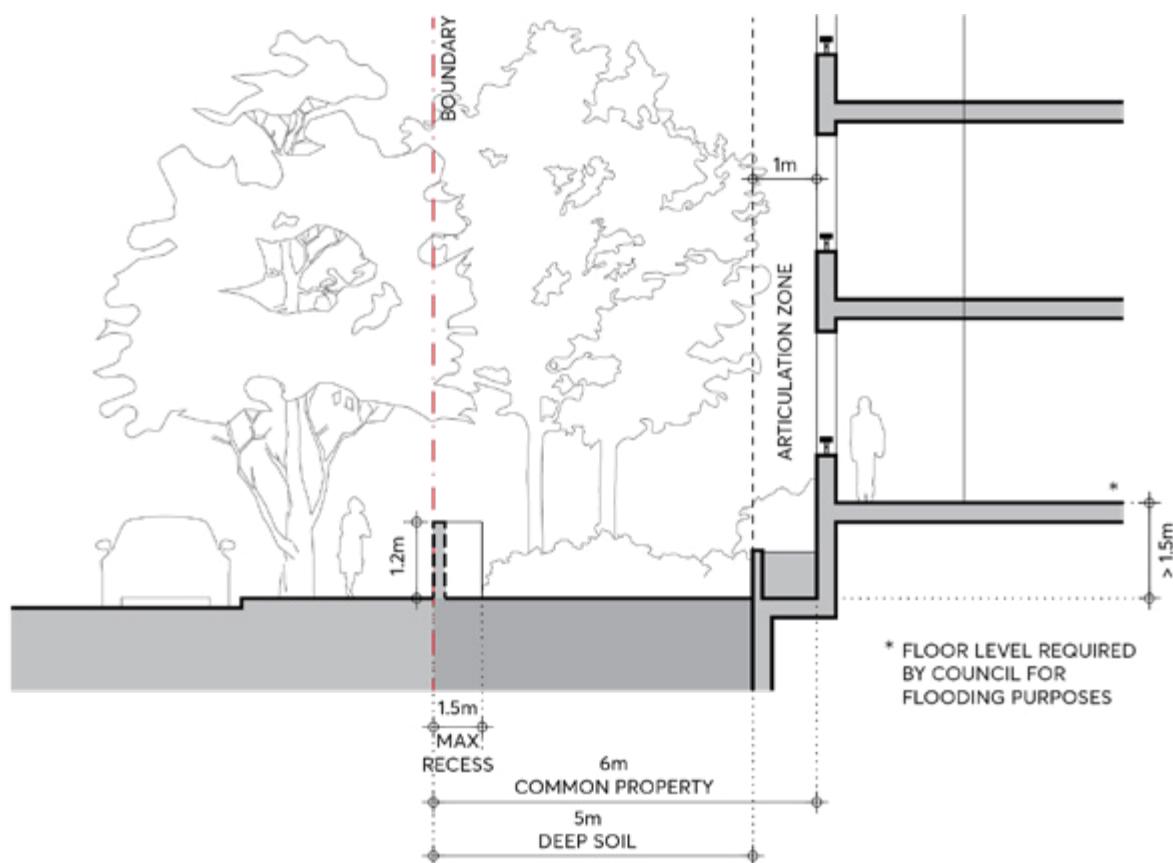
Residential Ground Floor: Floor level required greater than 1.5 metres above footpath level
